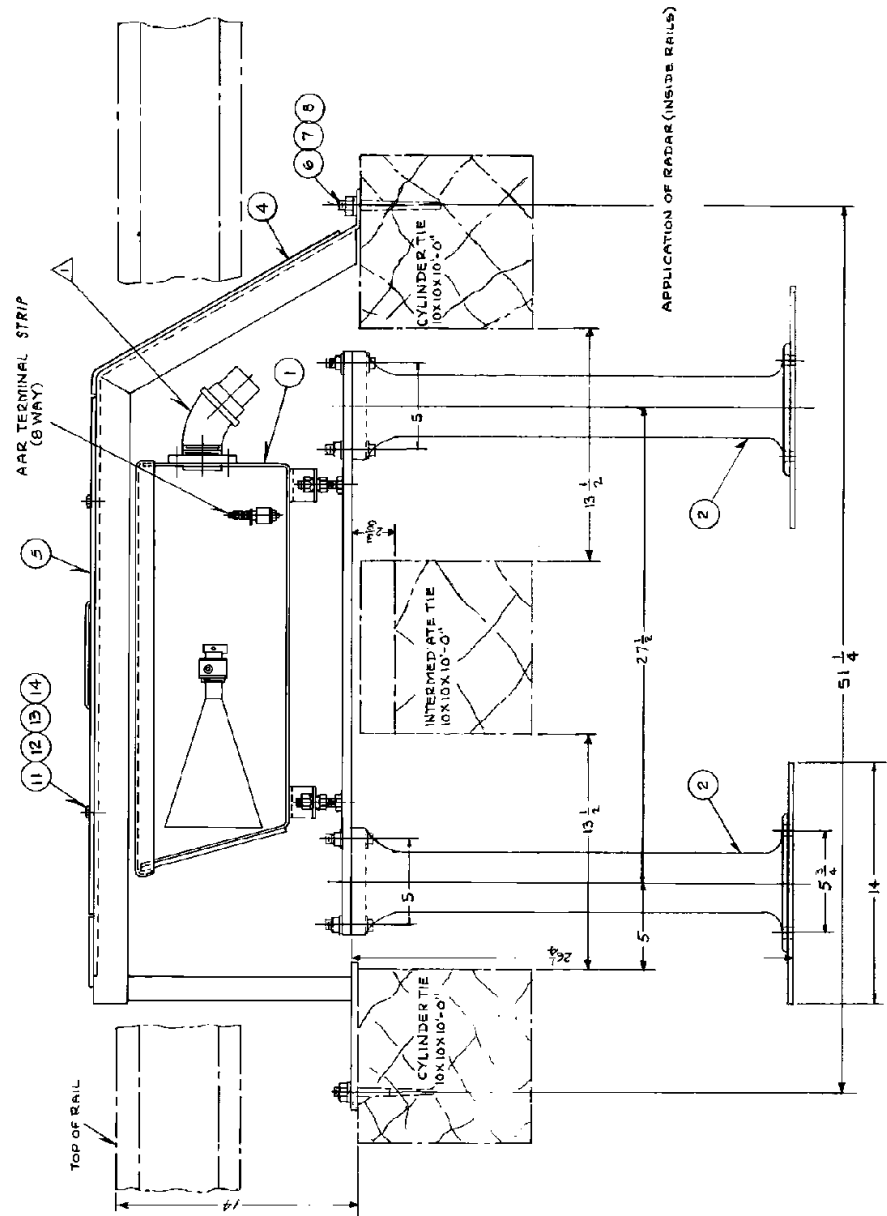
(a). DR-50 Radar, Application Between Rails, Ballast Foundation
